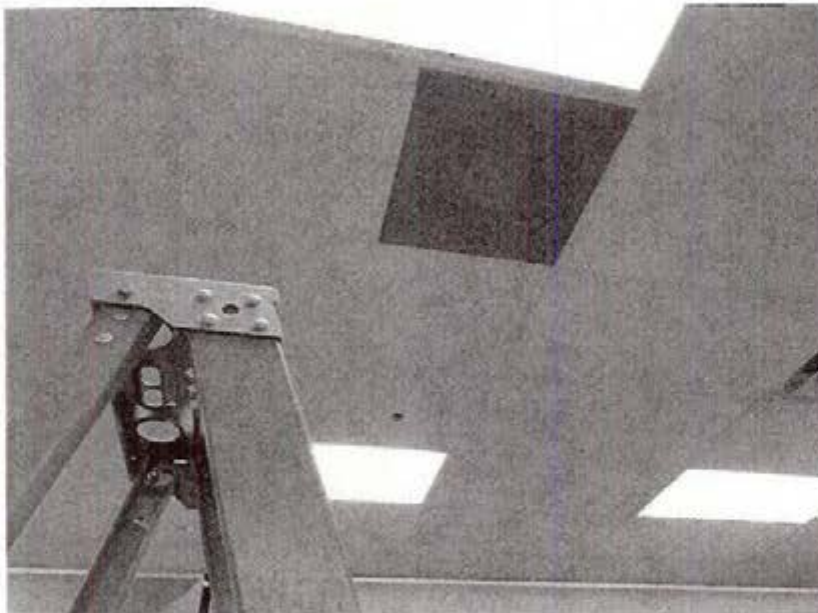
Lead wipe sample (042414-IFR-W-13) collected from the north return air vent in DOL-15.
